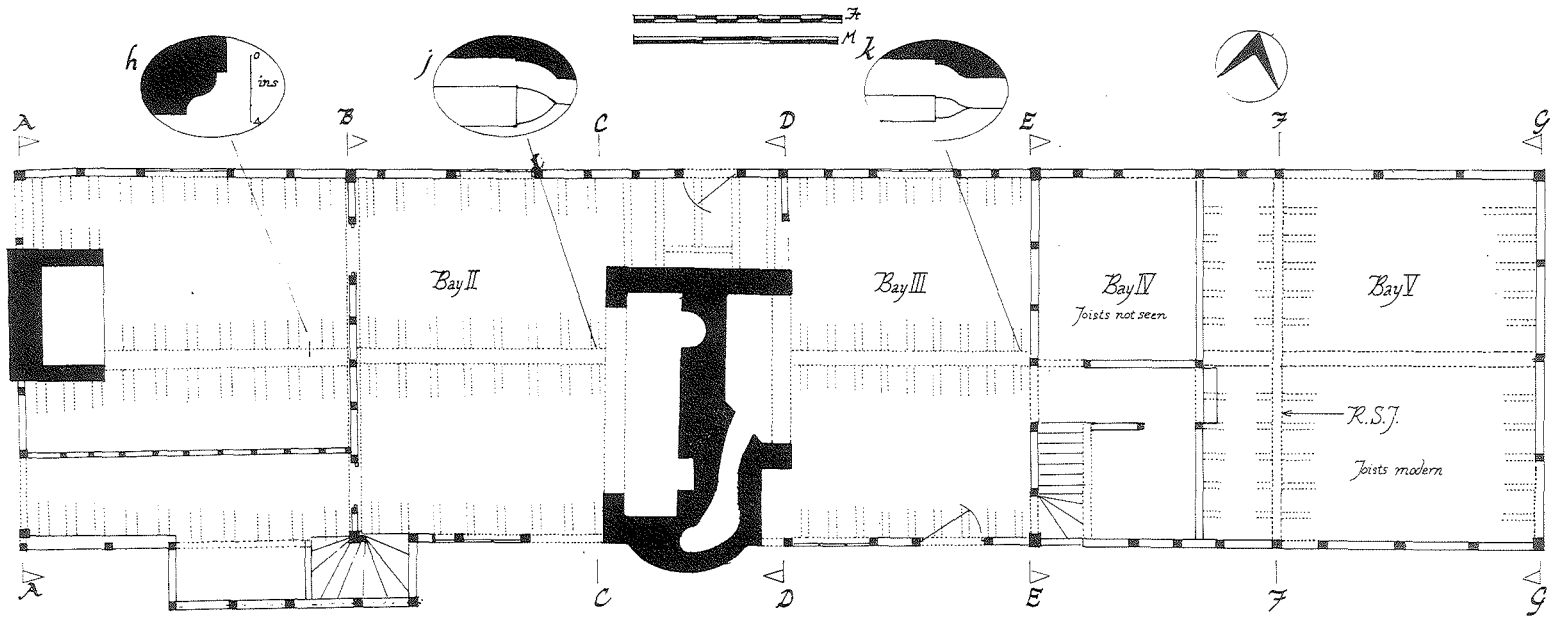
Willow Vale Farm, Steeple Claydon: ground-floor plan.
